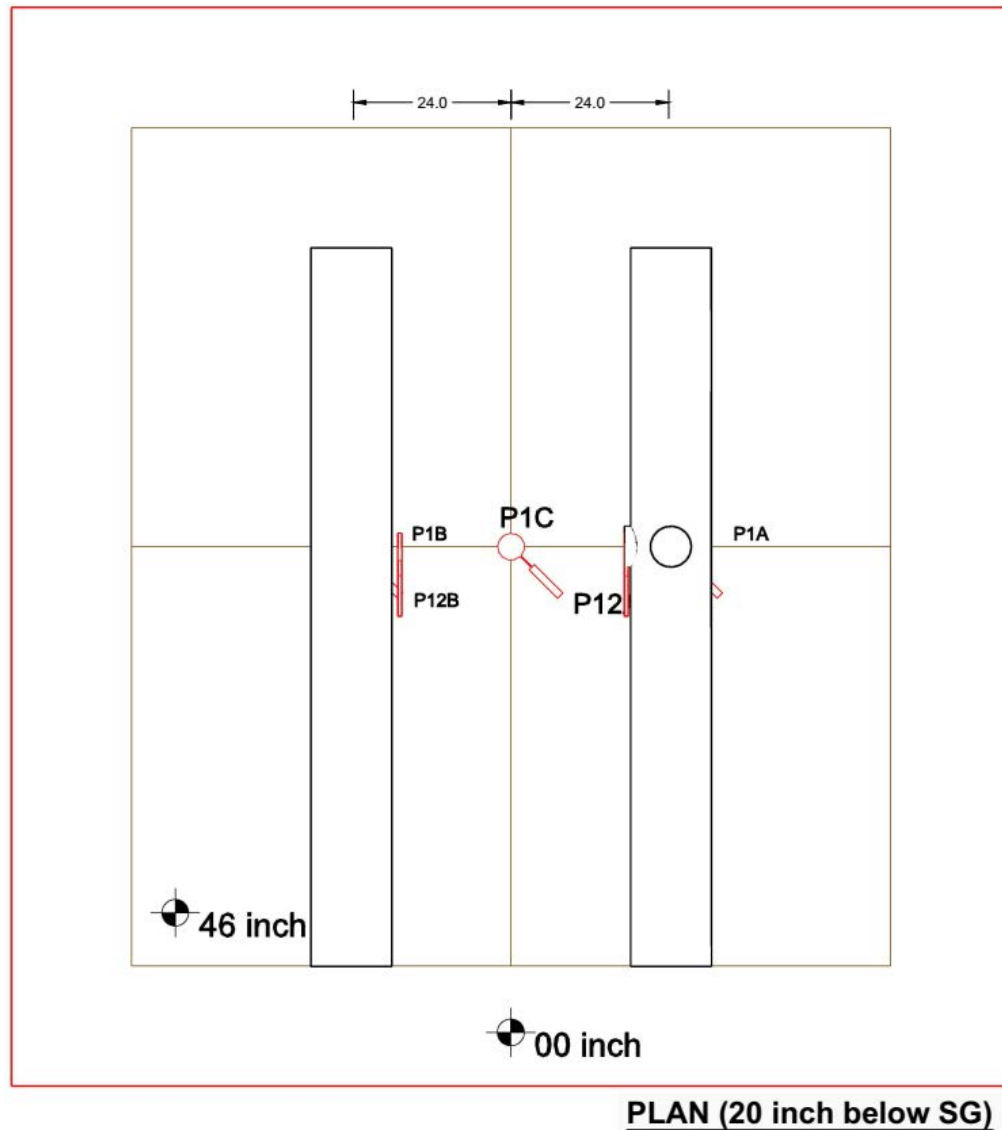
Illustration. Plan view of large-scale box instrumentation in experiment No. 5 (depth of 60 inches).
